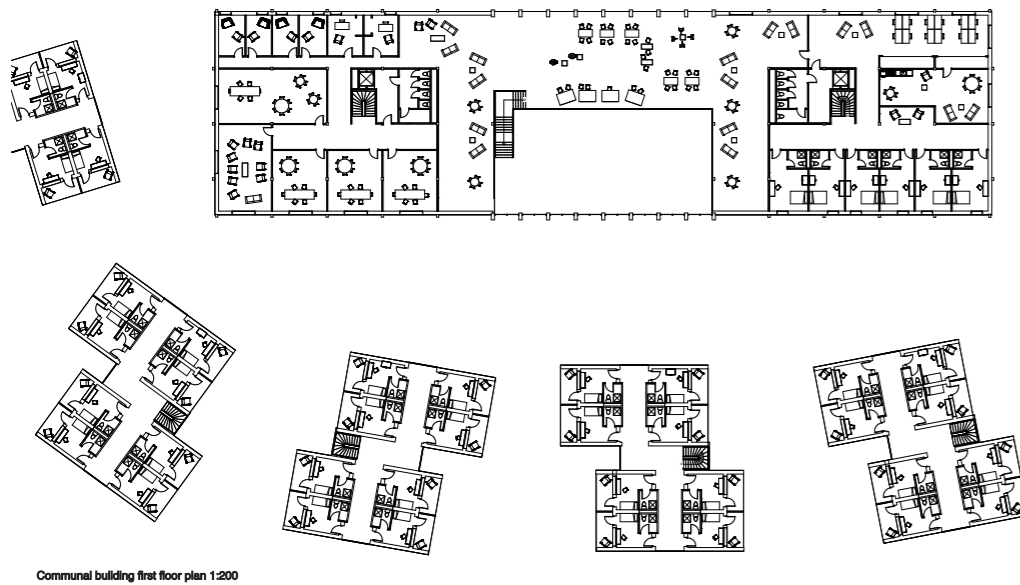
Communal building first floor plan 1:200 rescaled. Source: Own work, 2026.
